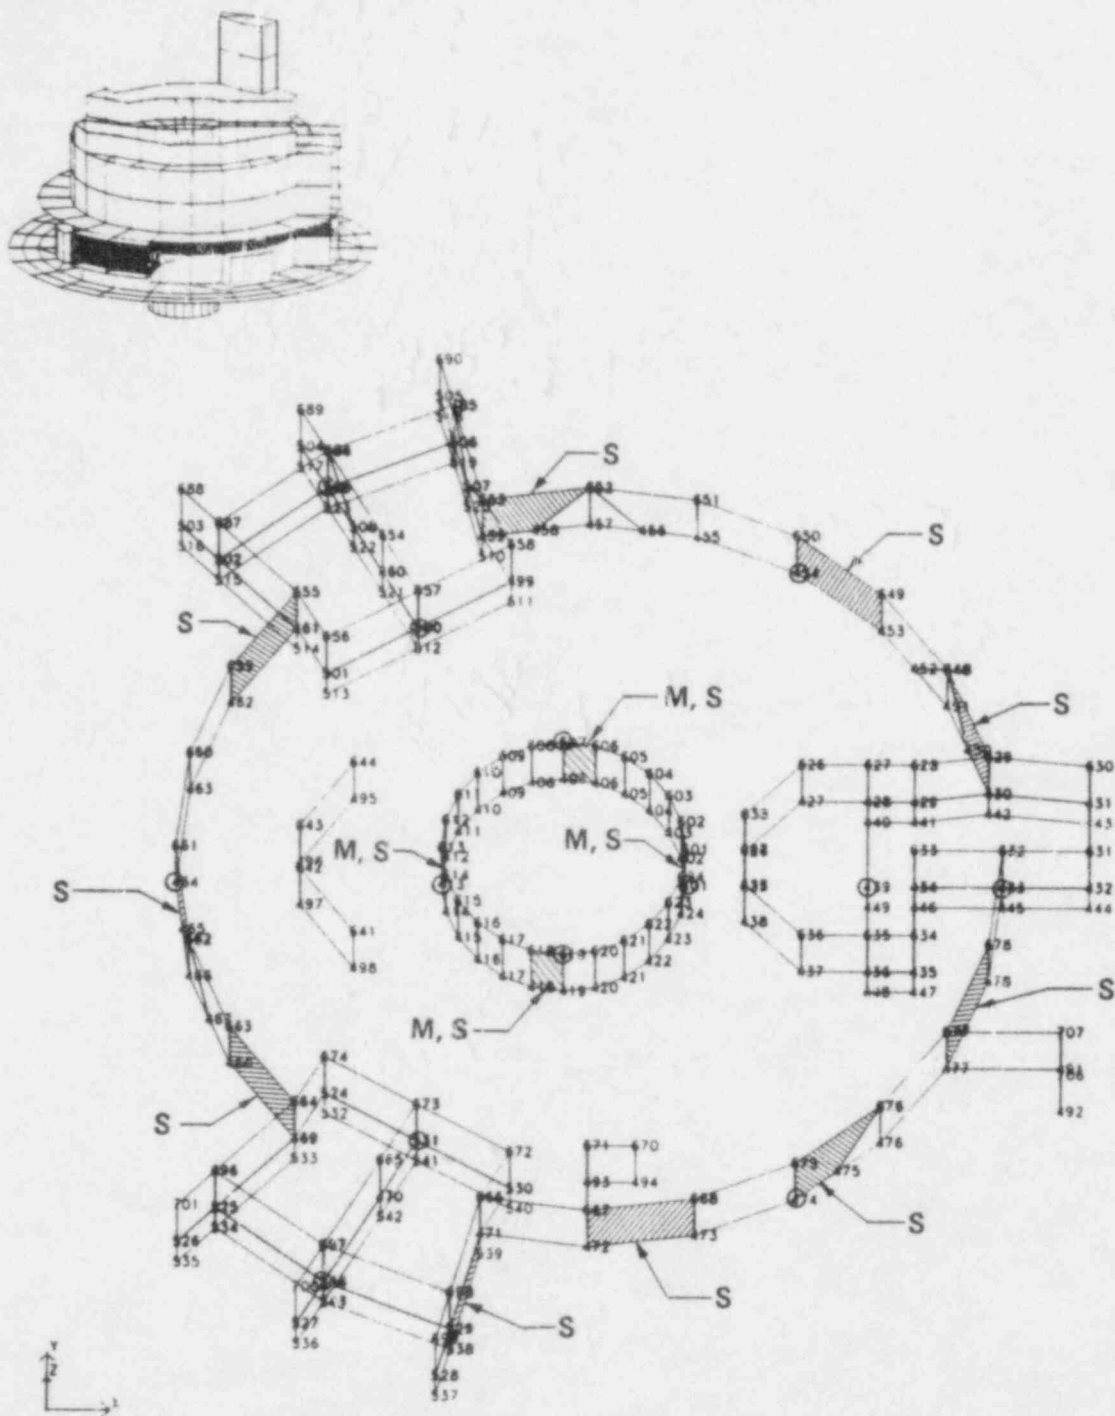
Perspective view of biological shield wall, ring wall, and fuel handling pool wall between El. 576 ft. and El. 590 ft.
